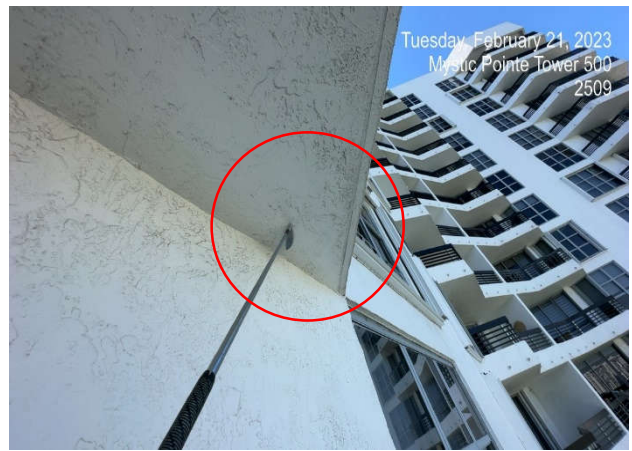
c.6 – Hollow sound and stucco delamination at balcony ceiling (Unit 2509)
